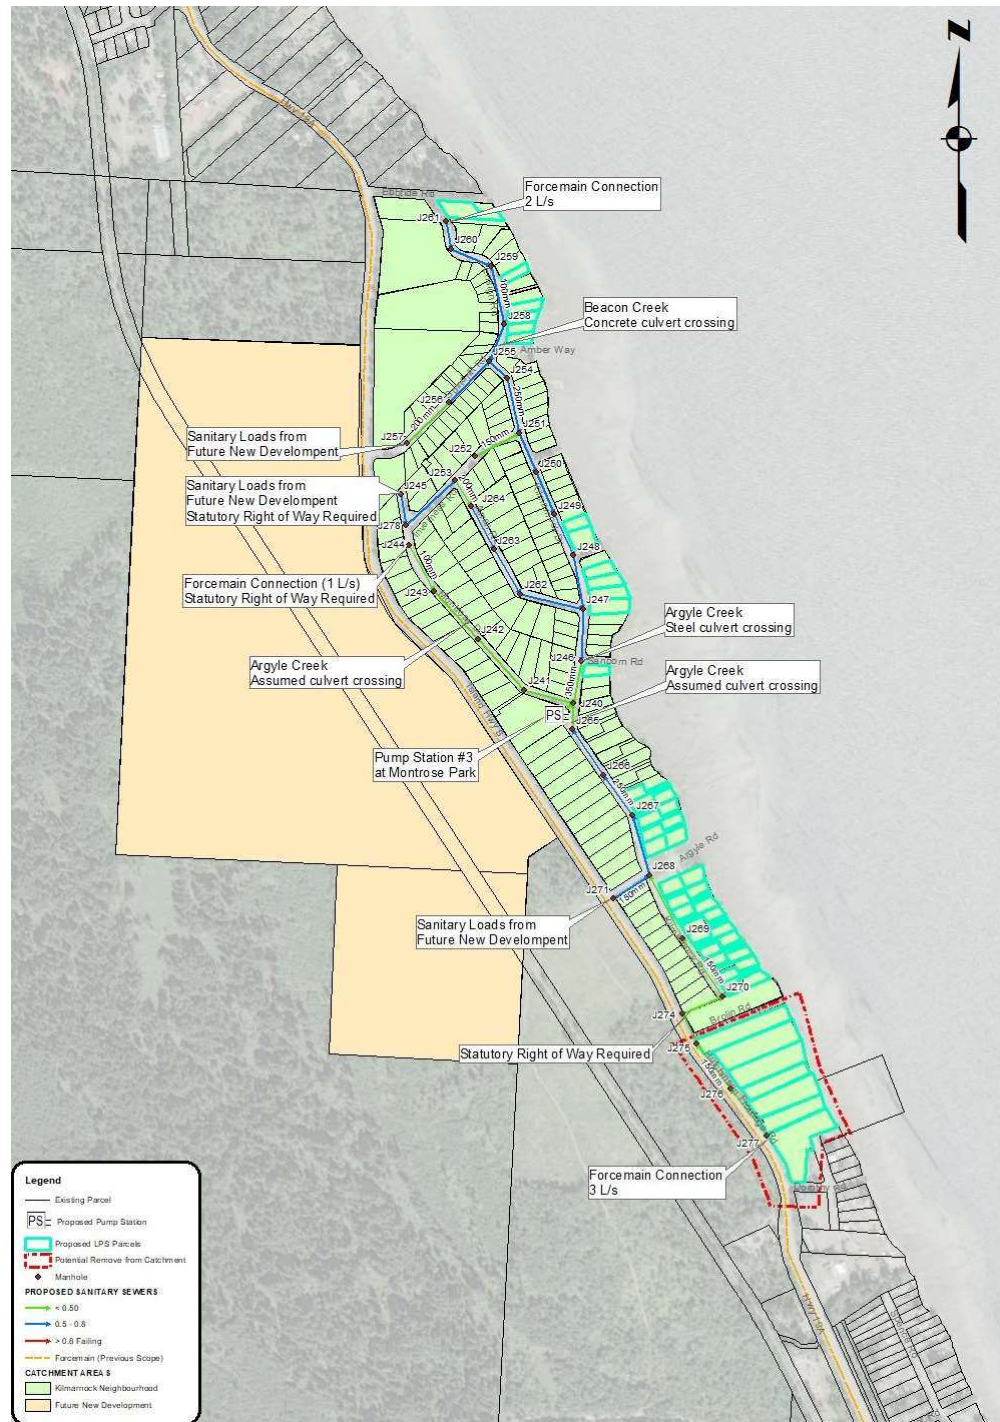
Pump station #3 Kilarnock Neighbourhood proposed collection system – Option 1
